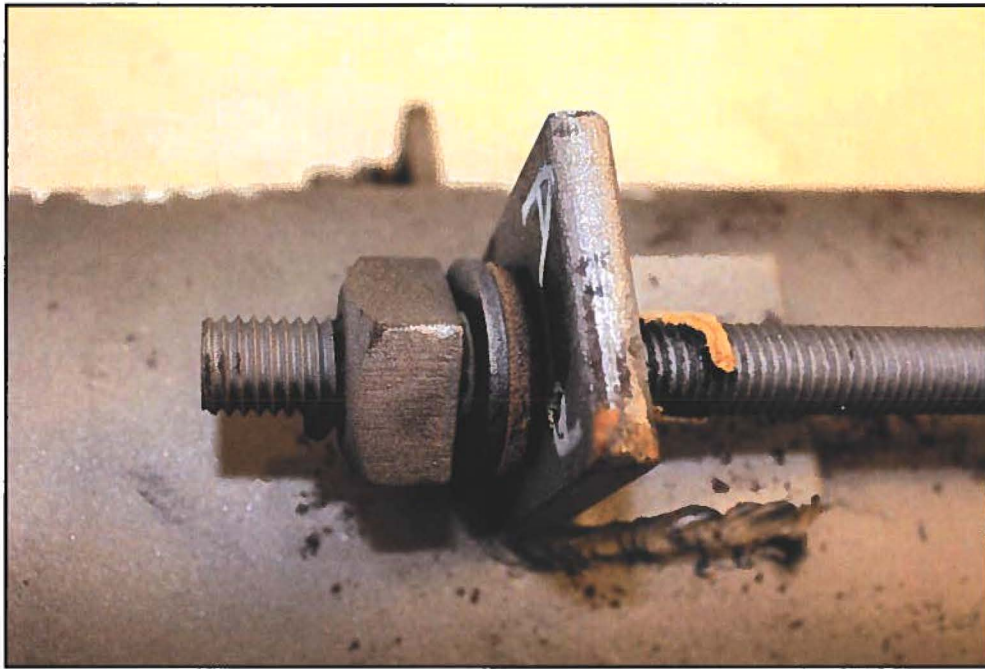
Image of the Lug A6 fastener assembly which was loose.
